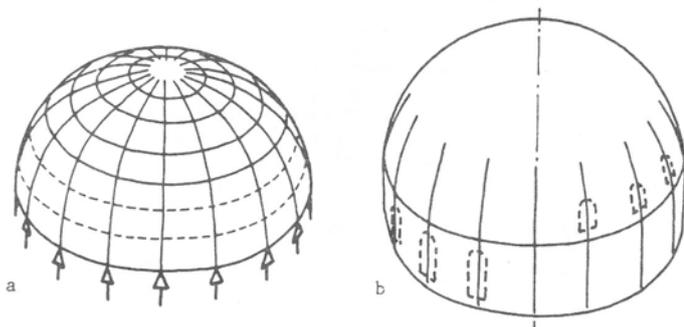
Structural system and cracks in the dome masonry structure
